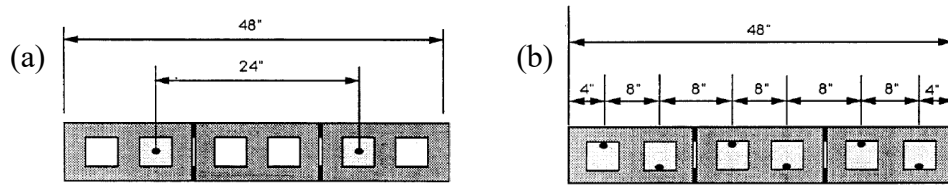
Location of vertical reinforcement in masonry walls (a) Rebar at the centre (b) Rebar staggered (Hamid et al., 1989).
